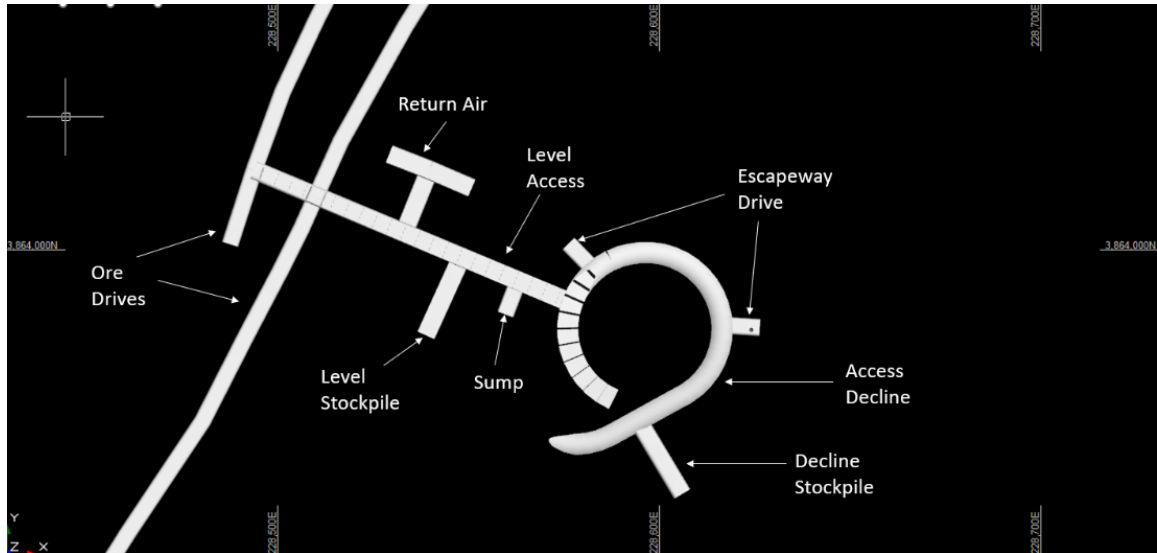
Typical Sub-Level Layout (Plan View 768 mRL)
